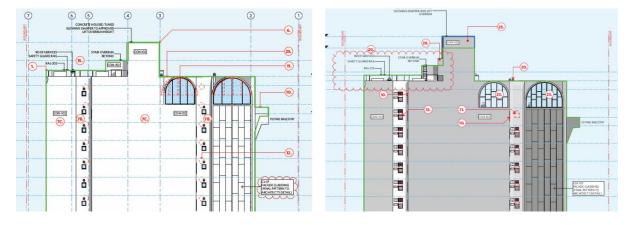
Left: north elevation plan extract, as approved by 'Modification A' (D/2020/1387/A). Right: proposed north elevation plan (amended during assessment), showing reduced plant height.
